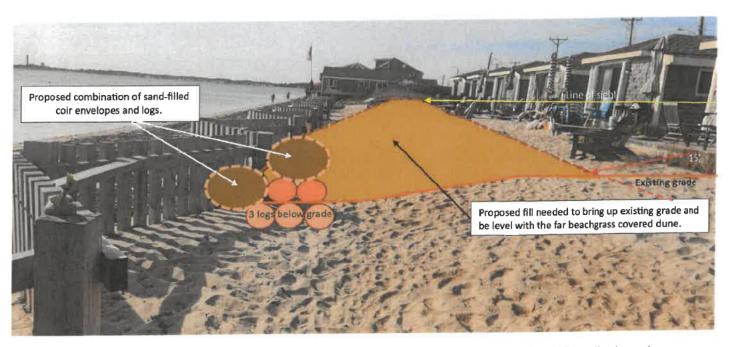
Detailed cross-section of the three proposed components of restoring and protecting the Primary Frontal Dune:1) coir envelopes; 2) coir logs; and, dune nourishment planted with beach grass.
